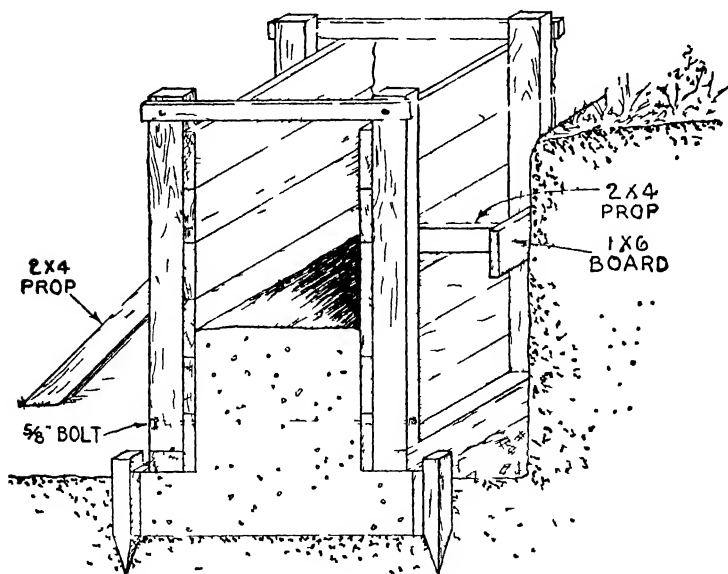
Form for concrete foundation wall and footing. Such forms should be made of semi-seasoned wood as when thoroughly seasoned the wood will warp badly when the wet concrete is placed. Spruce, Norway pine, etc., are better woods to use than hickory or Georgia pine. For ordinary foundation work 1 inch boards may be used. The studs may be assisted materially in holding the forms in position by wires placed on studs. And by props placed against the dirt wall of the excavation. *In filling* use a wet mixture 14 inch layer and then spade or work it well into place. The smoothness of the resulting faces is increased by an additional spading of the mixture away from the form. A good pading tool is made by straightening out an ordinary garden hoe. Forms should be allowed to remain until the concrete will resist indentation with the thumb upon ordinary walls.
